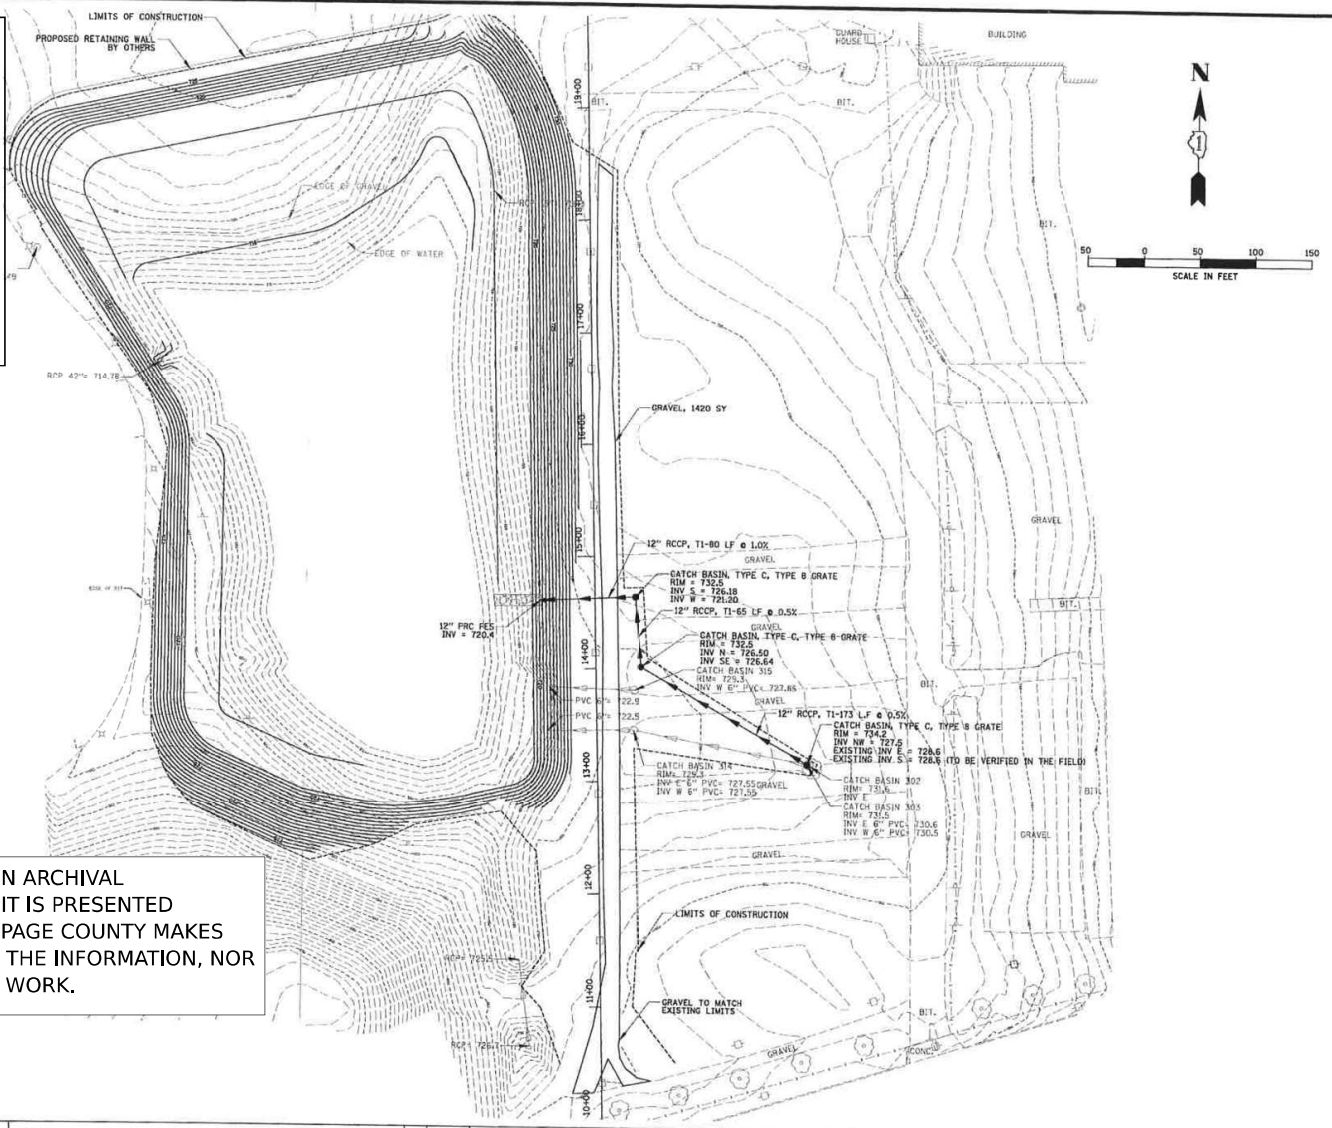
DETAIL PROVIDED FROM DRAWING S-1 OF THE SAME RETENTION BASIN RECONFIGURATION (EAST POND) PLAN SET, 2/12/01. PROVIDED FOR REFERENCE.
